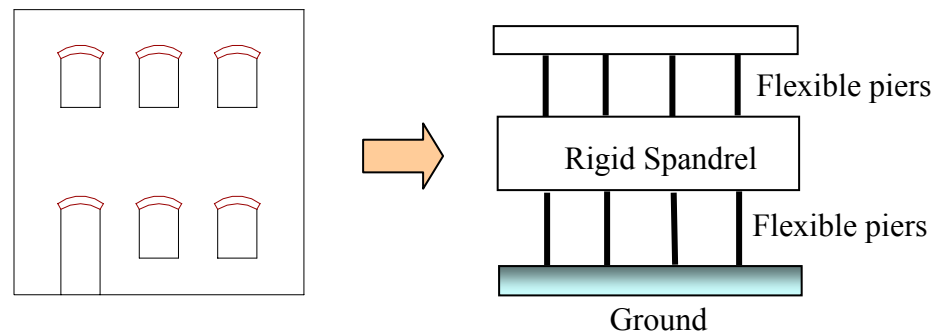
Solid spandrel-cracked pier perforated URM wall model
